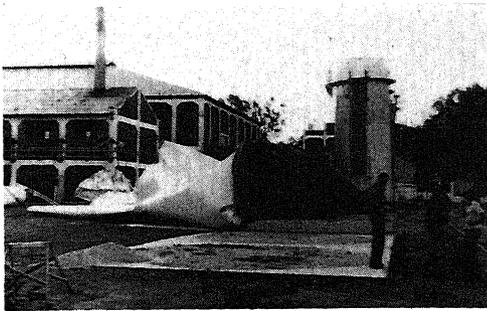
ANCHOR FAULT IN CILINDRICAL METALLIC TANKS
